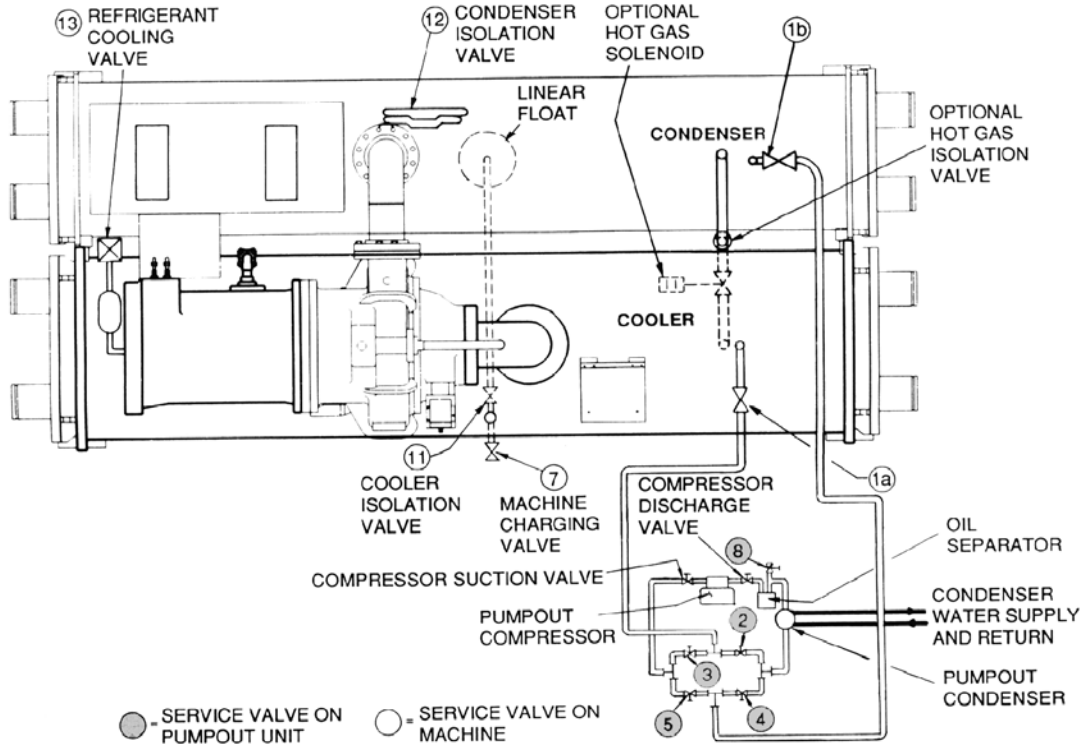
Typical Optional Pumpout System Piping Schematic without Storage Tank
